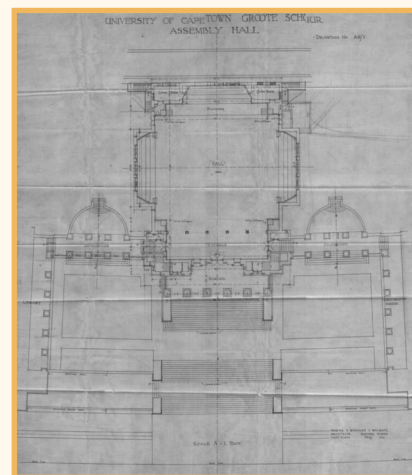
Original architectural drawing of Memorial Hall. Photograph provided by David Gibbs.
